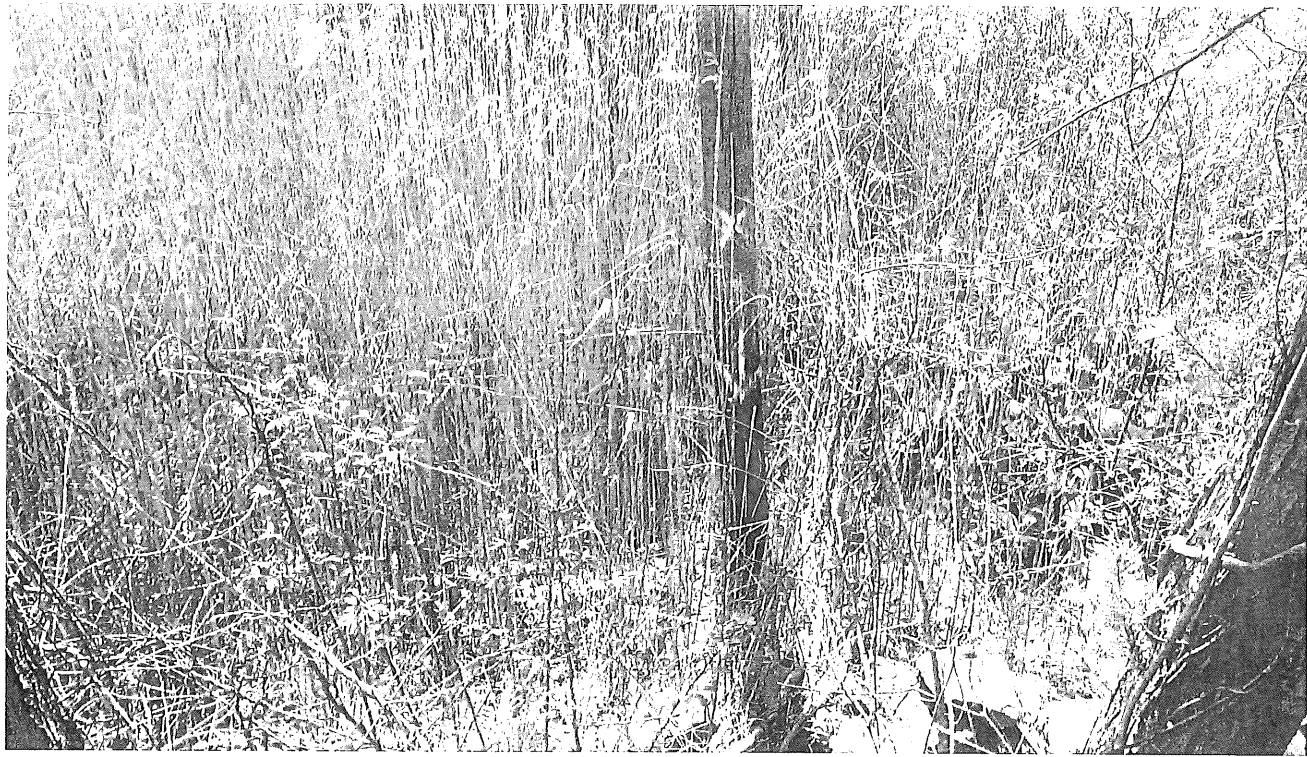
View of existing P17-1 within a BVW. A stone wall and upland slope are located between the pole and the access point on Route 20.
